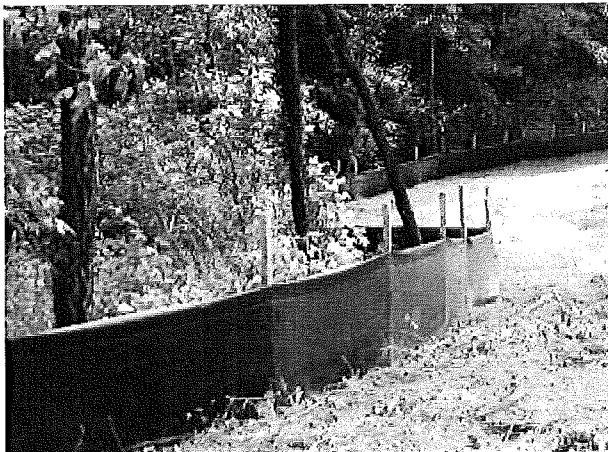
Silt Fences are placed at the perimeter of the job site to capture and prevent sediment from leaving the site.
